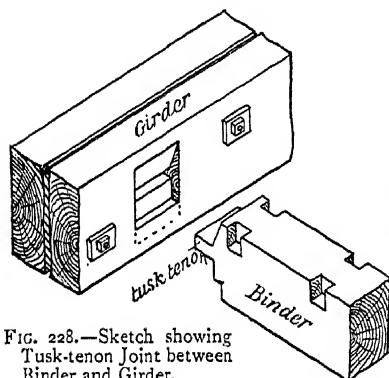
Sketch showing Tusk-tenon Joint between Binder and Girder.
